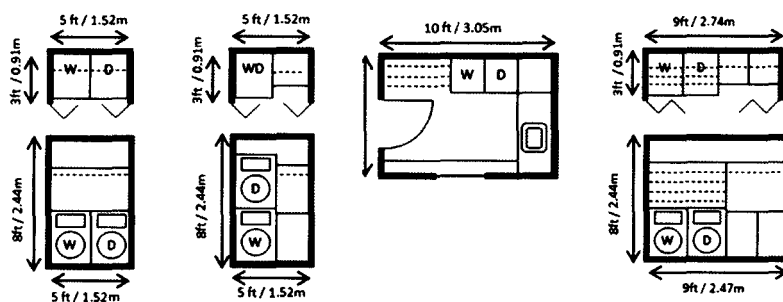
laundry size (Image source: <http://www.houseplanshelper.com/laundry-room-dimensions.html>)
